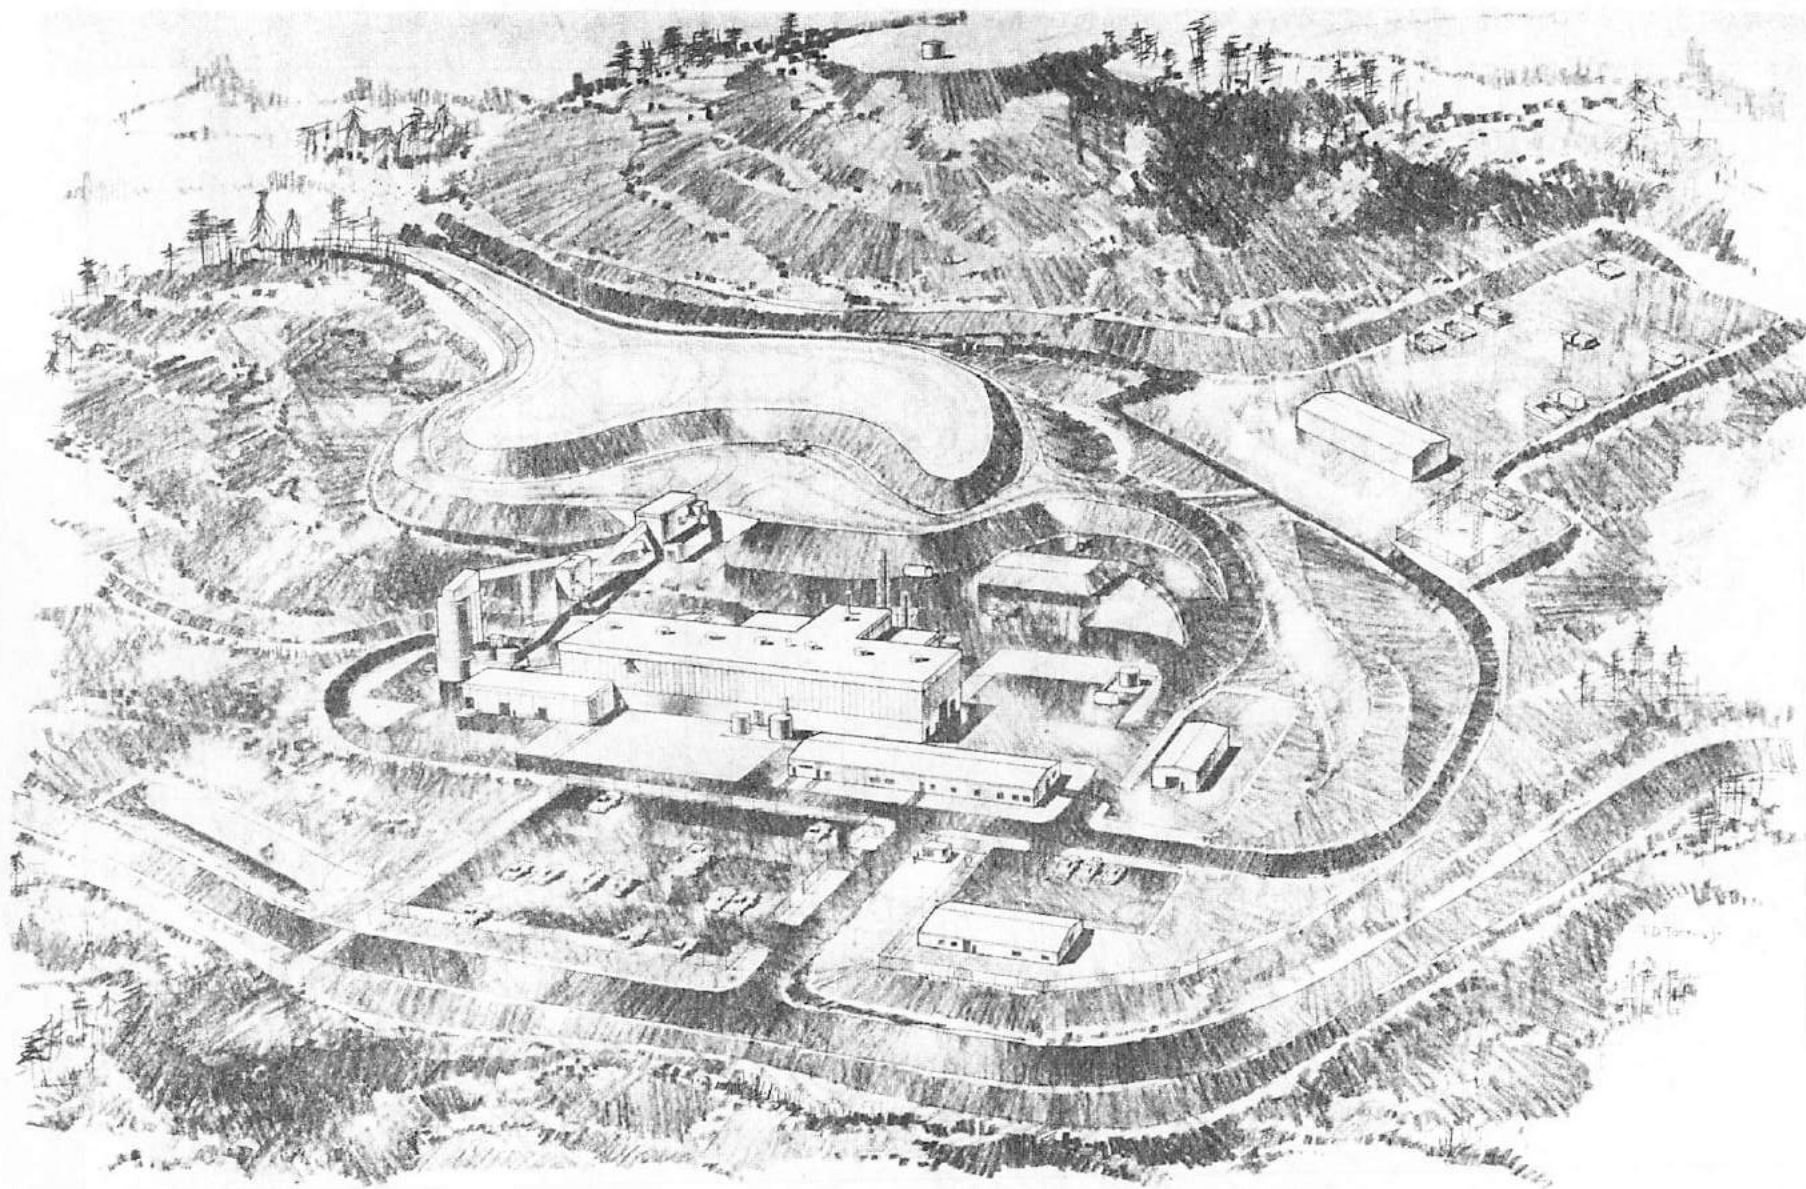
Building layout of the proposed mill. Source: ER, Plate 3.1-1, p. 3-2.
